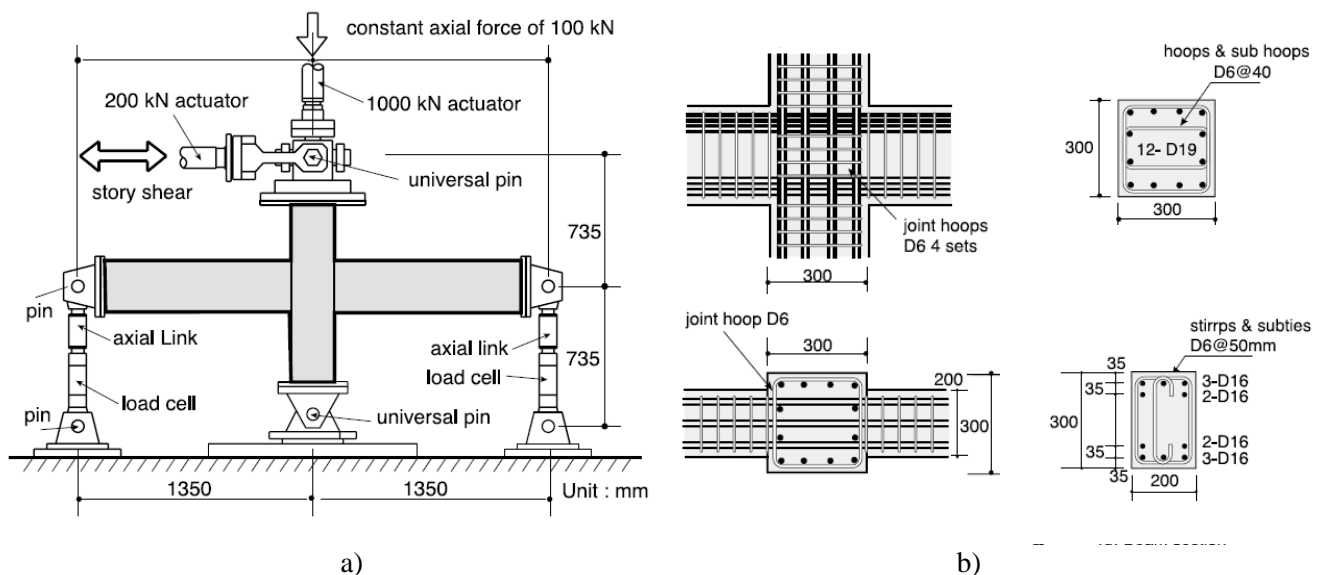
Zaid et al. (1999): a) Loading system; b) Geometry of the beam-column connection and reinforcement arrangement.
